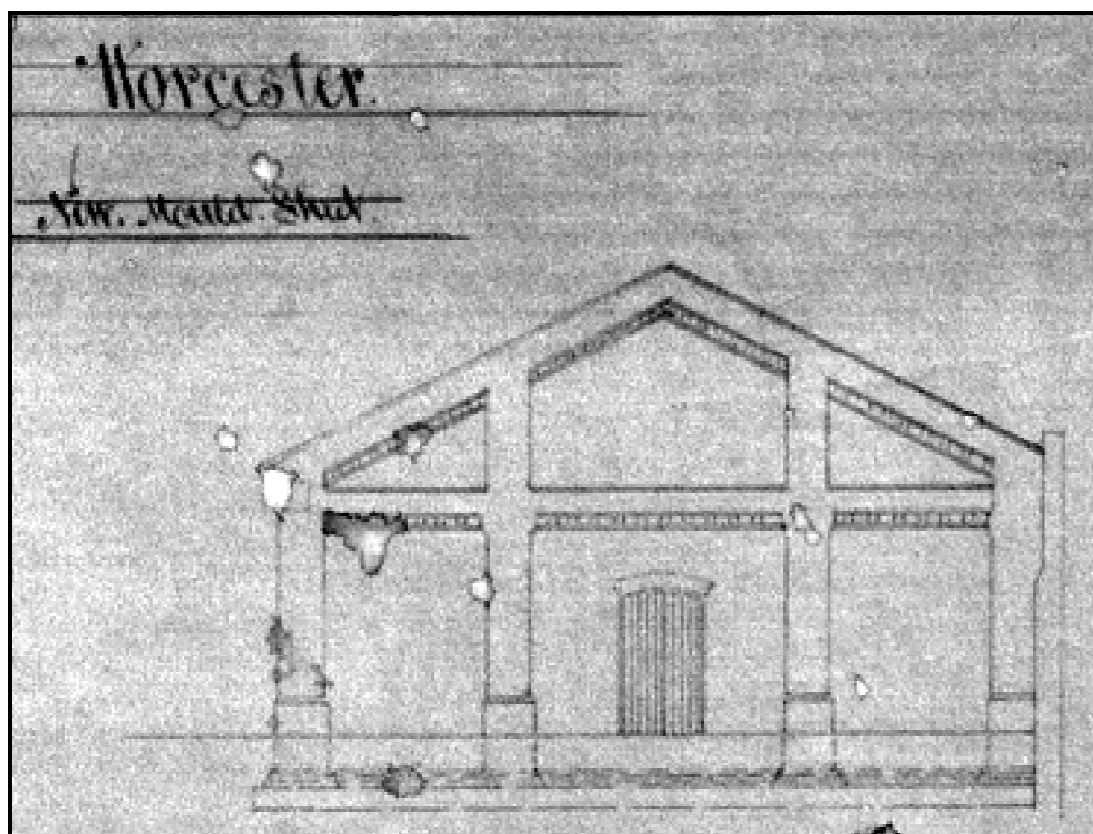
West elevation of the New Mould Shed in September 1875 (WPM)
